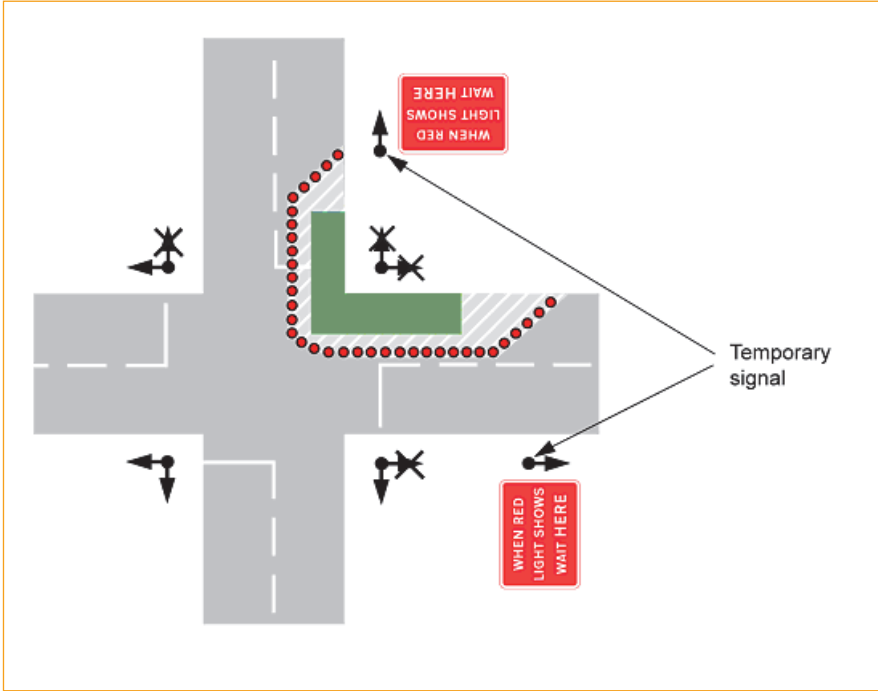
ROAD WORKS AT A CROSSROADS JUNCTION WITH TRAFFIC SIGNALS (LHS)
